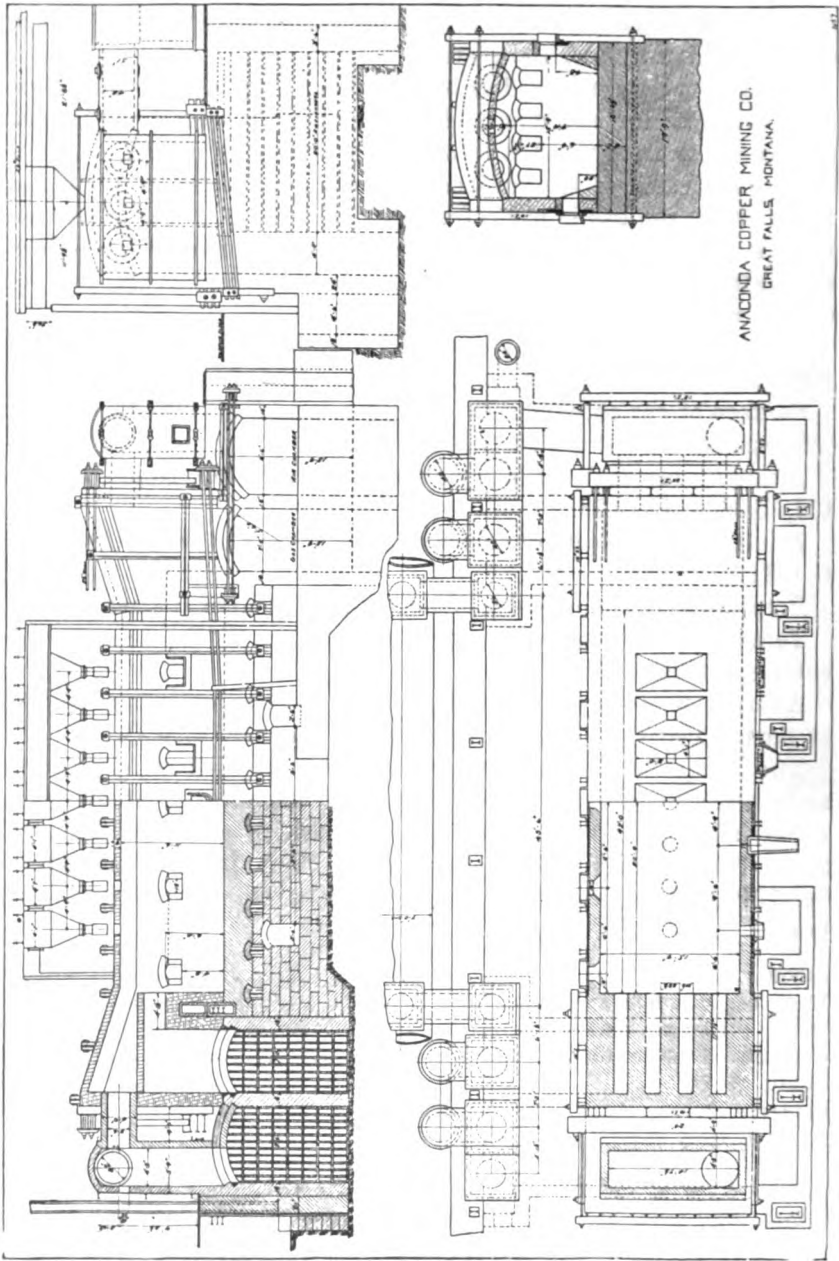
ANACONDA PLANT; PLAN, ELEVATION, AND BOILERS.
